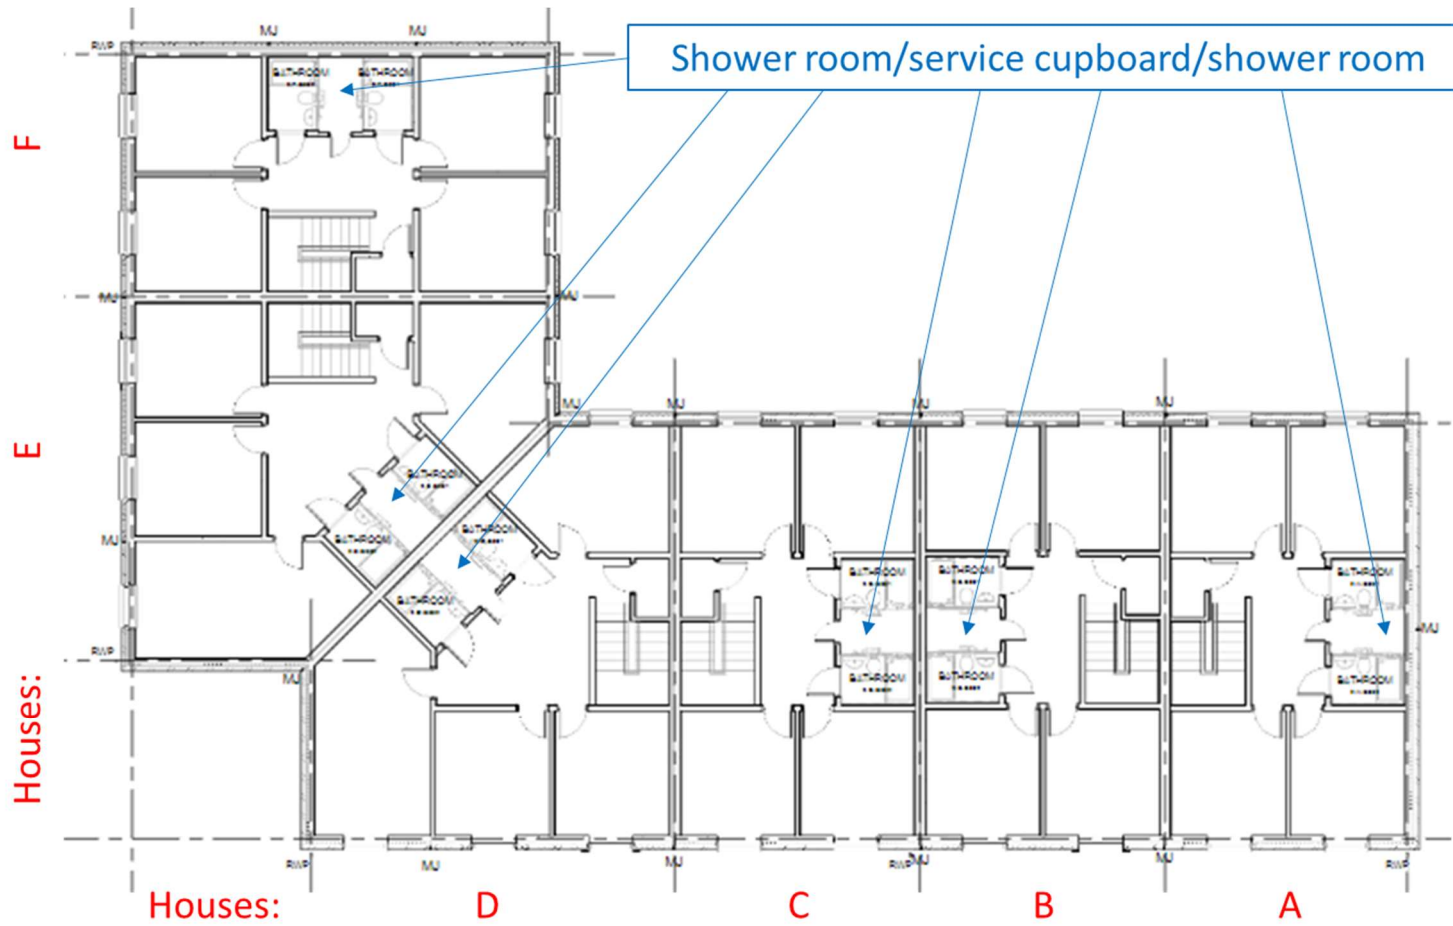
Plan of layout for houses A to F, first floor bedrooms and shower rooms (source: UWE)
